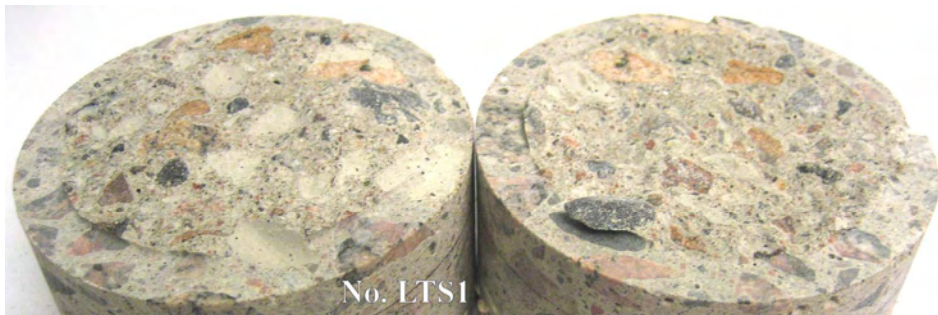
Photograph showing the failure surface for test No. LTS1 after tensile test.
